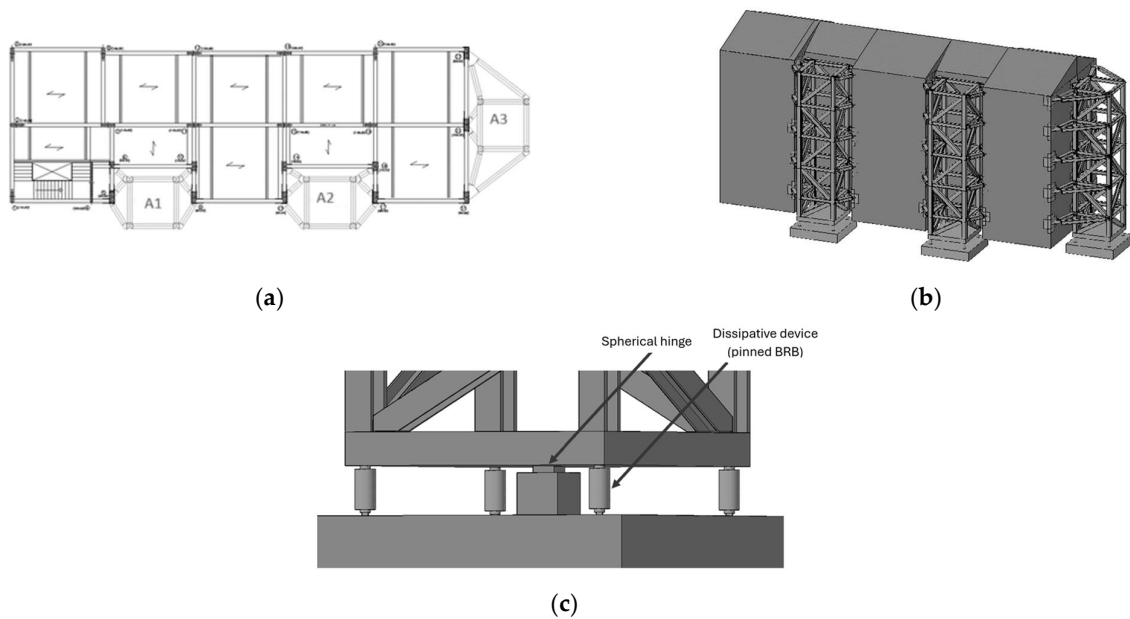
(a,b) Planar and 3D views of the retrofitted building (A_1 , A_2 , and A_3 are the designed ADSs); (c) detail of the base of an ADS.
